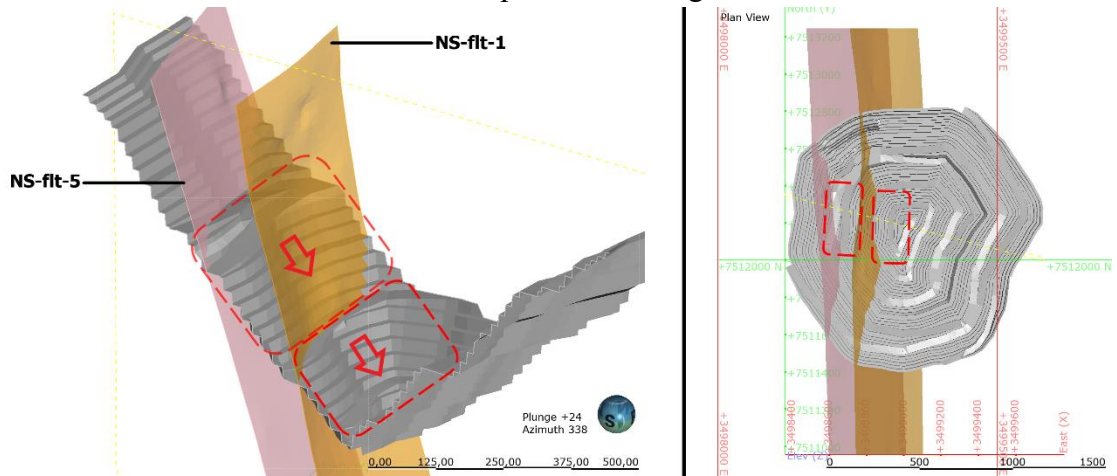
Slice of 3D view of Stage 5 pit. Potential planar failure from NS-ft-1 and NS-ft-5 in the north west wall.
